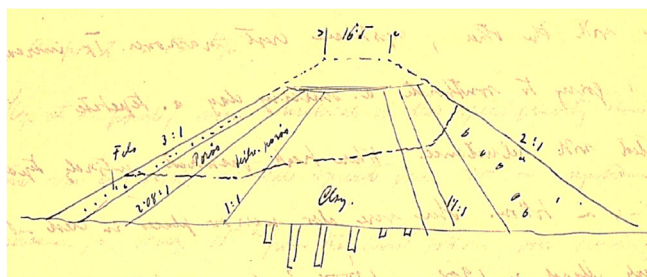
Necessity of zoned construction in hydraulic fills, Yakima project (Note II-28).
